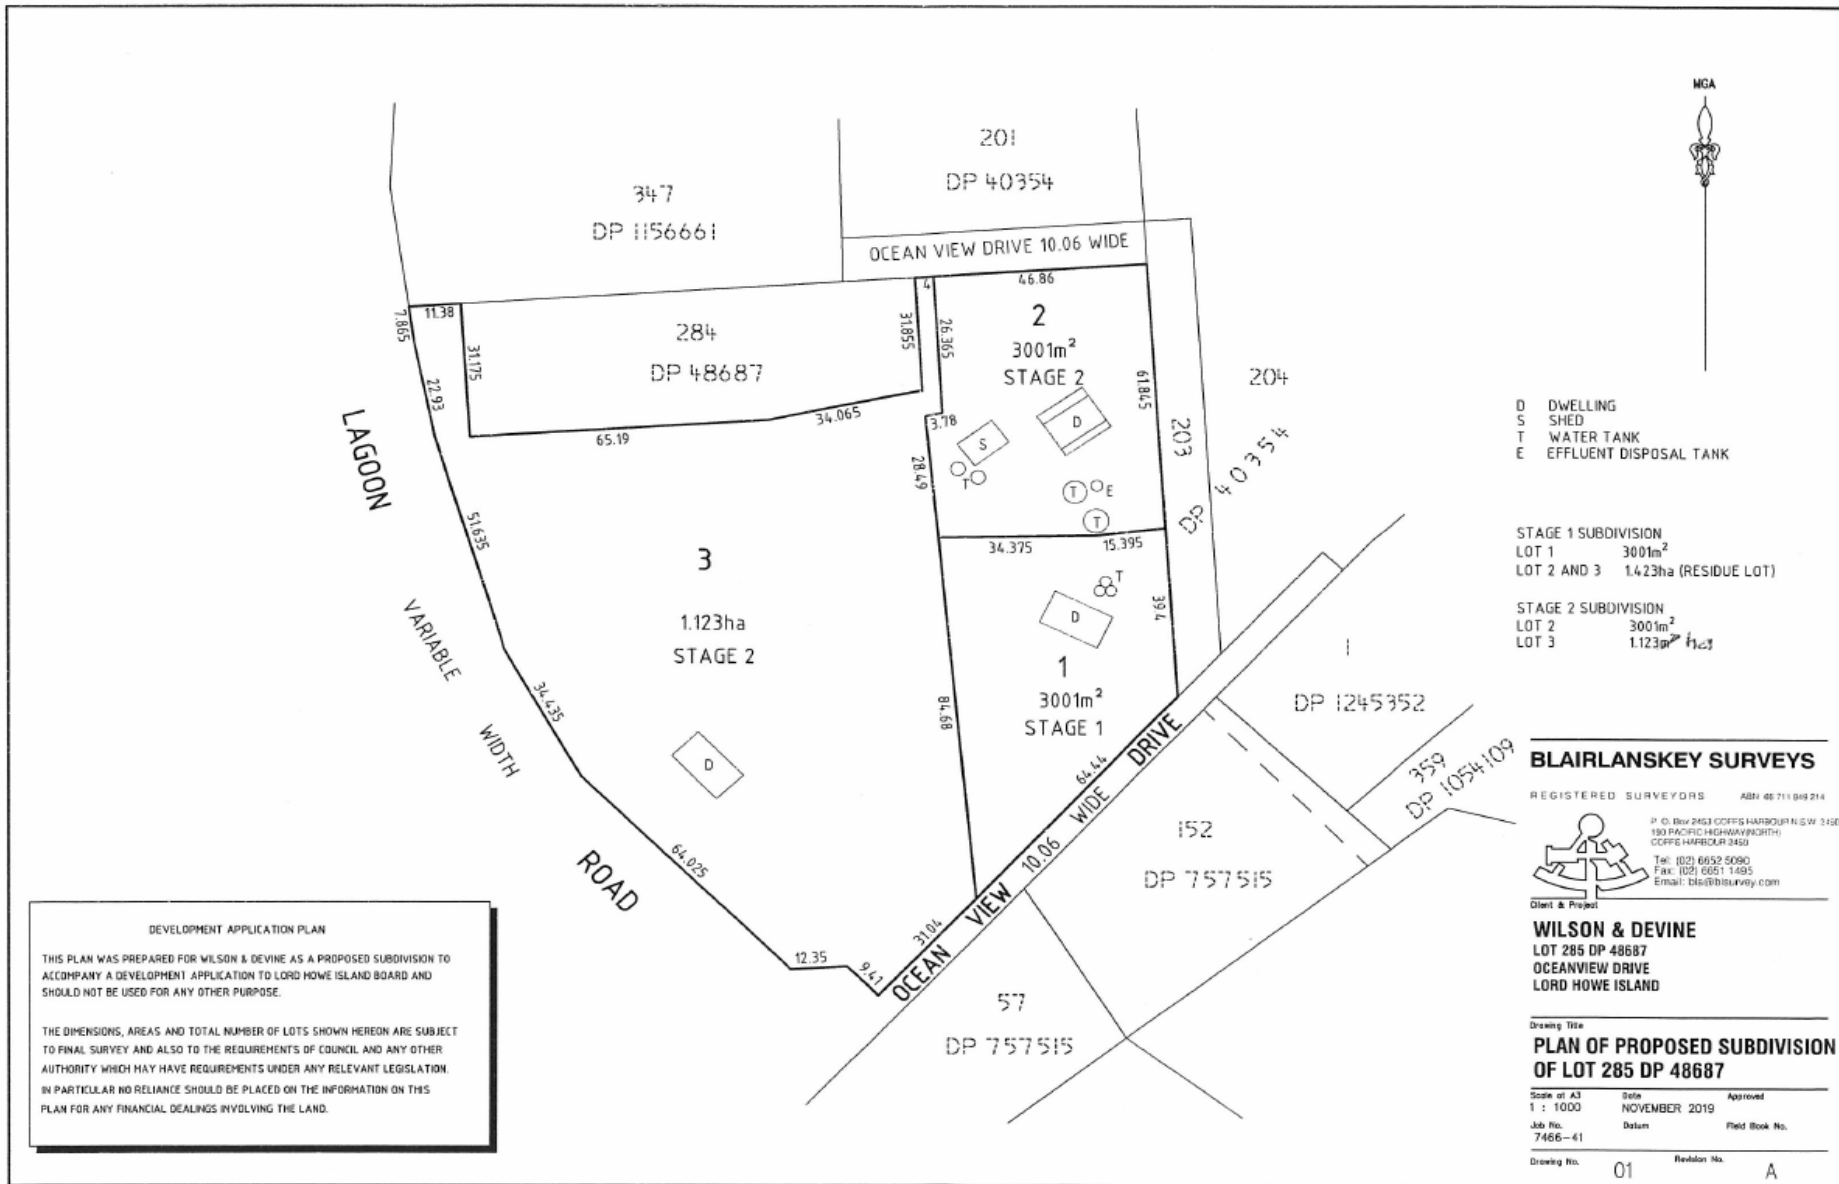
Applicant's submitted subdivision plan. Source: Blairlanskey Surveys
